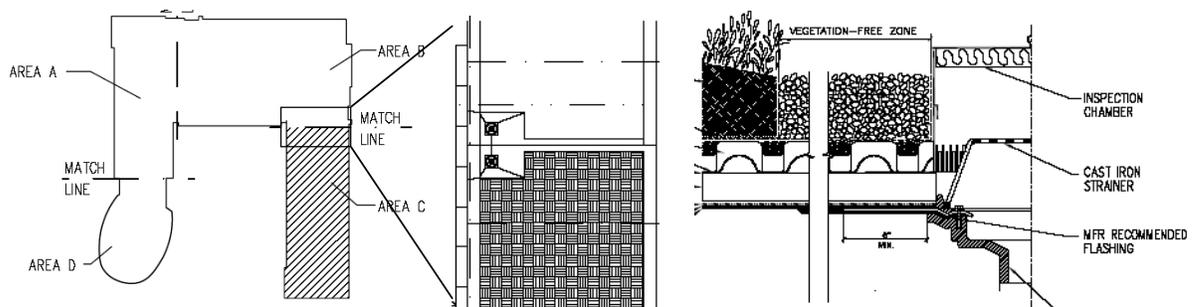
(left) Business instructional Facility with green roof location, (middle) plan view of green roof and conventional roof with two downspout locations, (left) cross section of green roof and drain.
